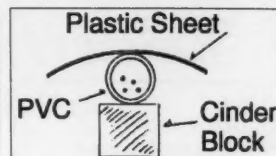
Cross-section view of the underground PVC pipe/cable raceway described in the text.
